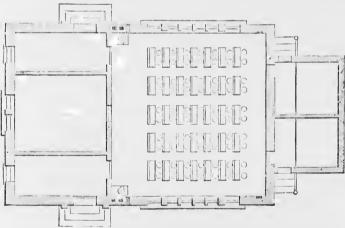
Ground Plan adapted to Figs, 88 and 90.
